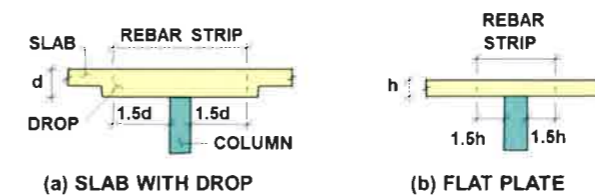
A-4 Minimum Reinforcement Lengths and Layout for Common Conditions
